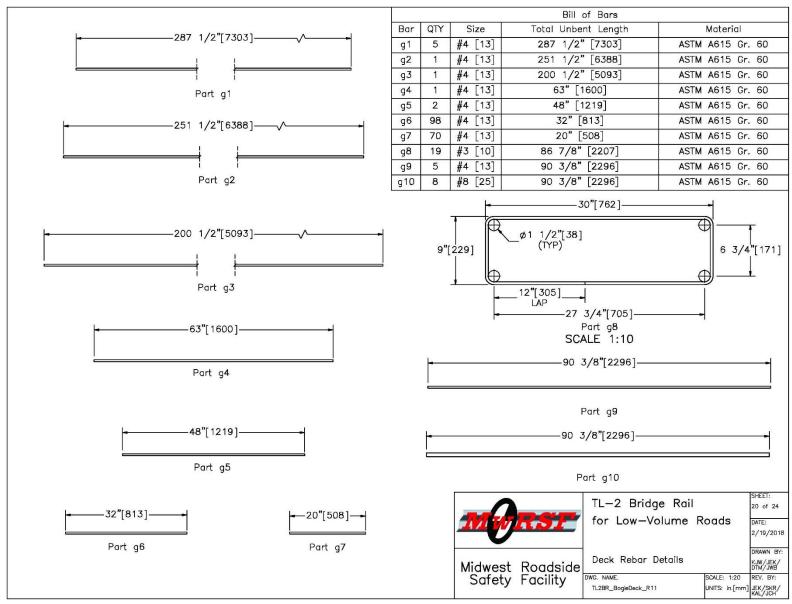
Bogie Testing Matrix and Setup, Deck Rebar Details
